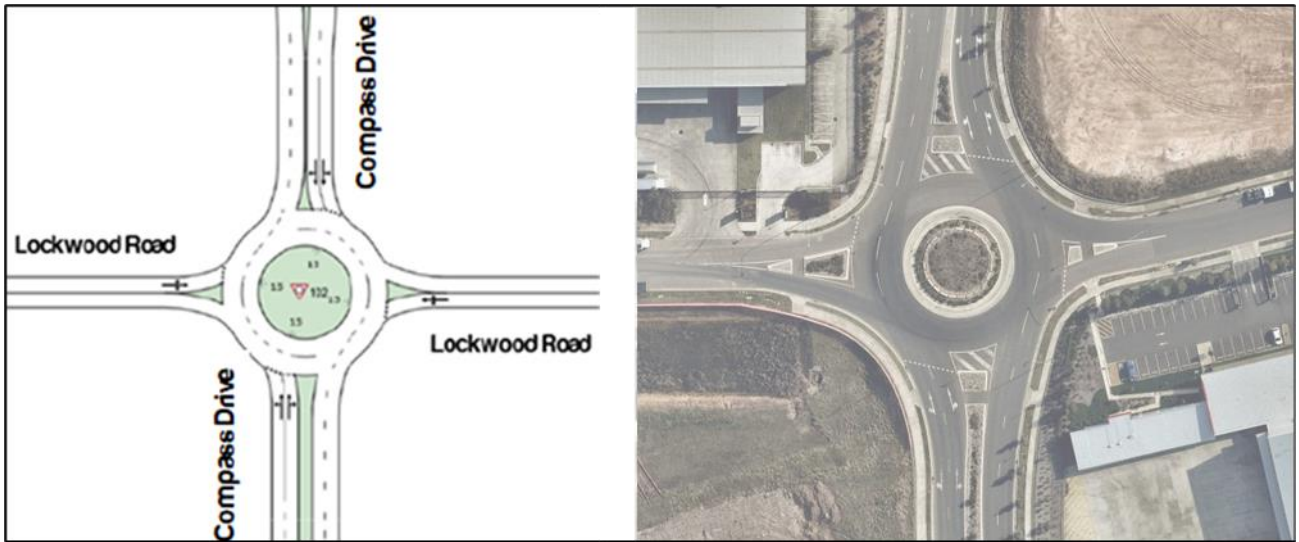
Intersection Layout of Compass Drive & Lockwood Road
